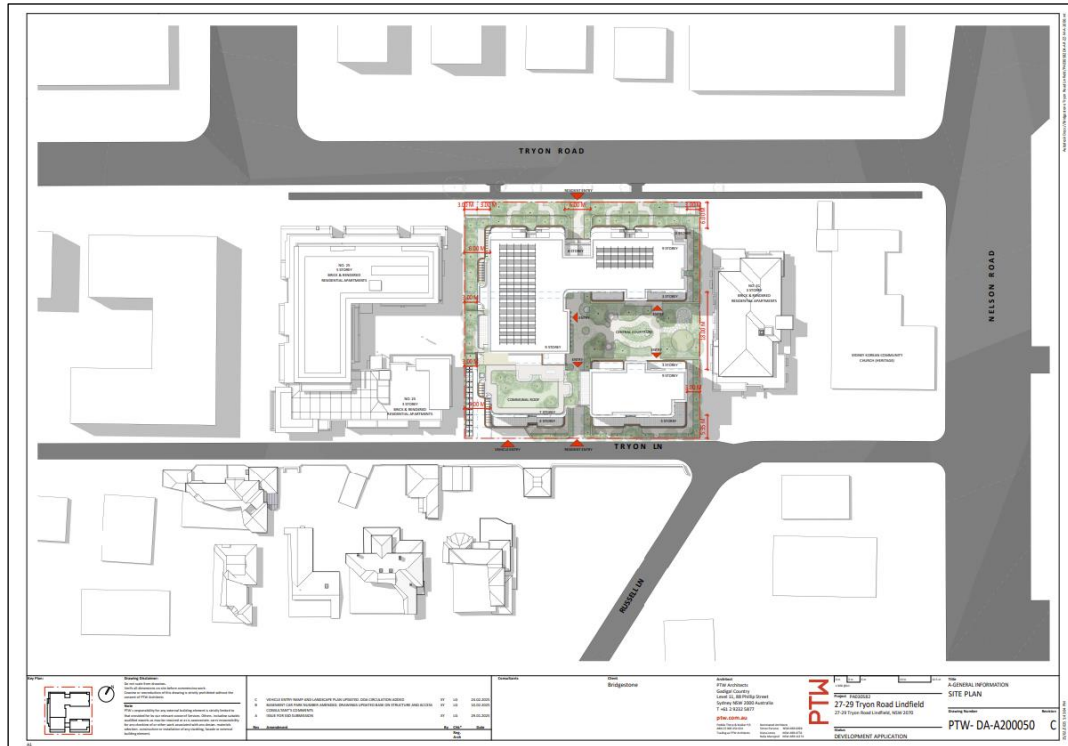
Proposed site plan. (Source: PTW Architects, Site Plan, Drawing No. PTW-DA-A200050, Rev. C)
